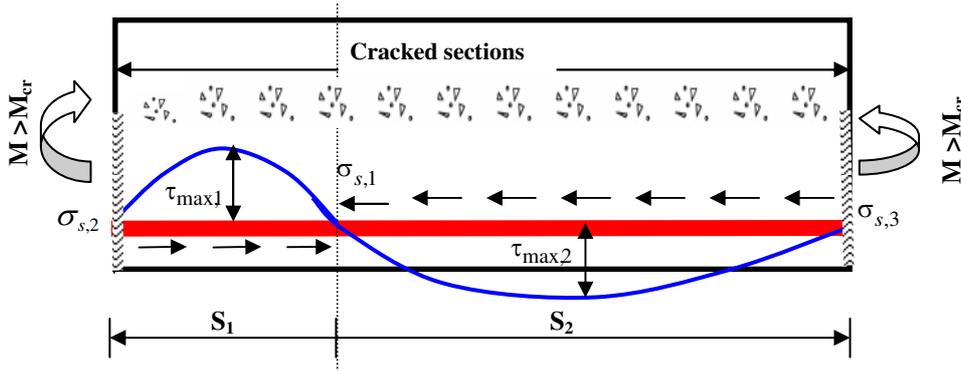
Bond stress between adjacent cracked sections in varying moment case
